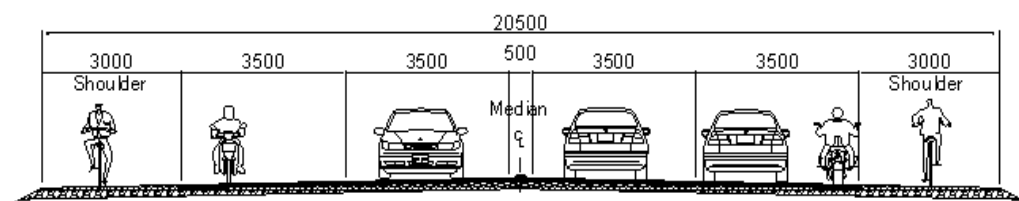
Typical Cross Section of North Section of Existing NR 5
